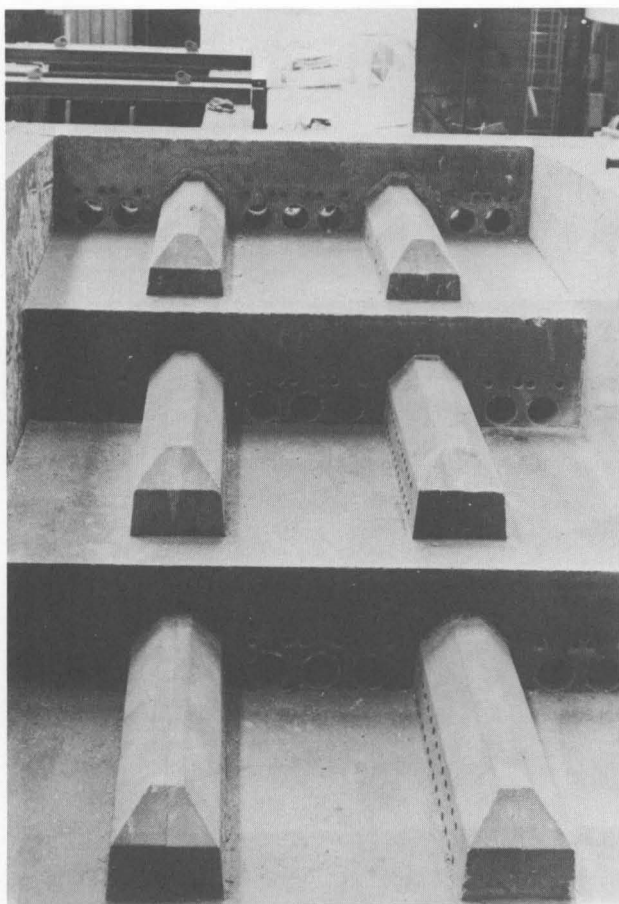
VIEW OF STEPPED REFRACTORY HEARTH
